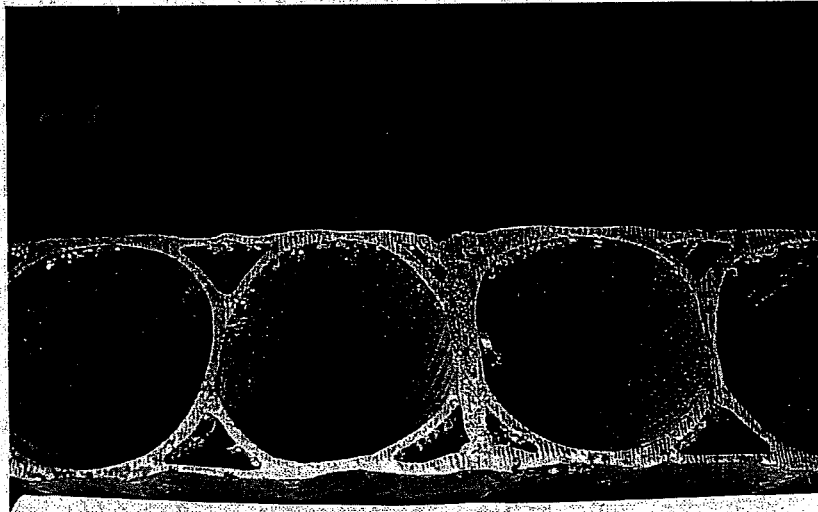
Inside and Outside Wall Surfaces of ADS 48
